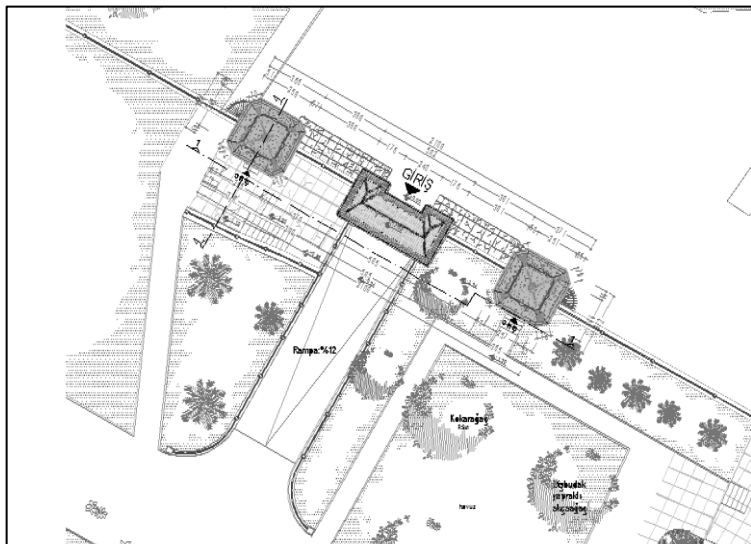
Mecidiye Gate Layout Plan (Author Archive, Bimtaş, 2009)
